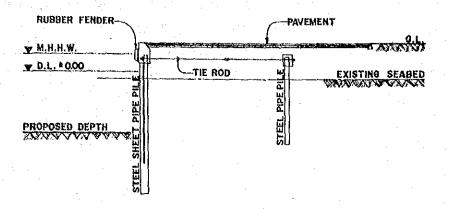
STEEL SHEET PILE TYPE QUAYWALL (-10.0m)
